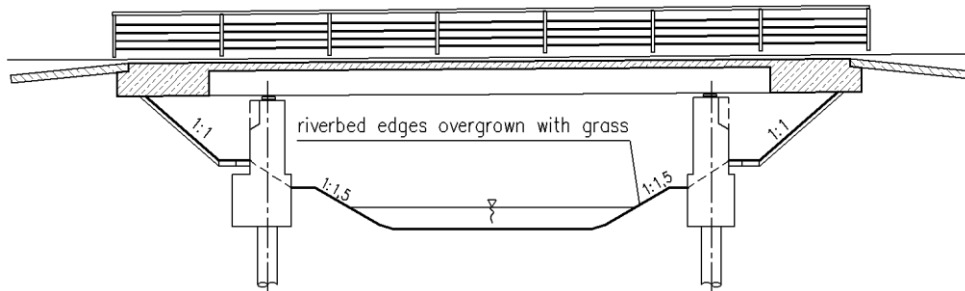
Two-support bridge based on foundation stilts – state before lowering the bottom of riverbed
